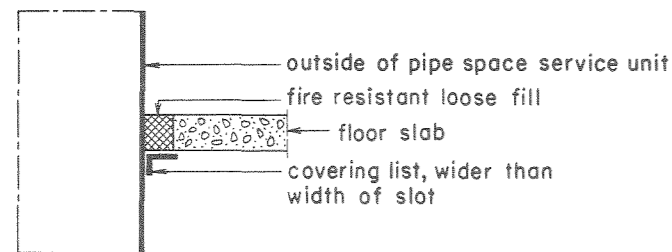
Example: Sealing of slot between pipe space service unit and floor slab
